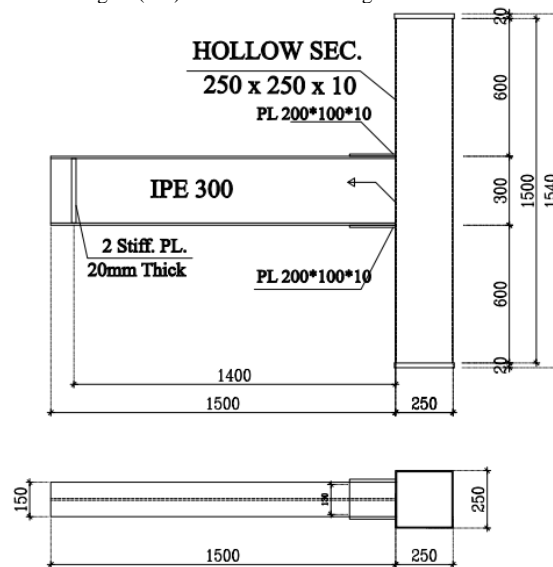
B.C. Stiffened Plate welded on beam flange (S-7)
